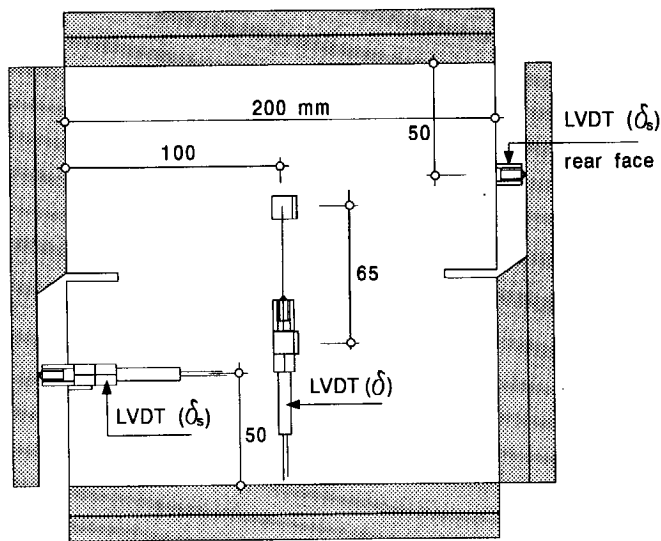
The arrangement of two vertical and two horizontal LVDTs on a 200 mm specimen.
